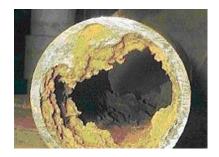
Example of Pitting Corrosion in pipes [22]
